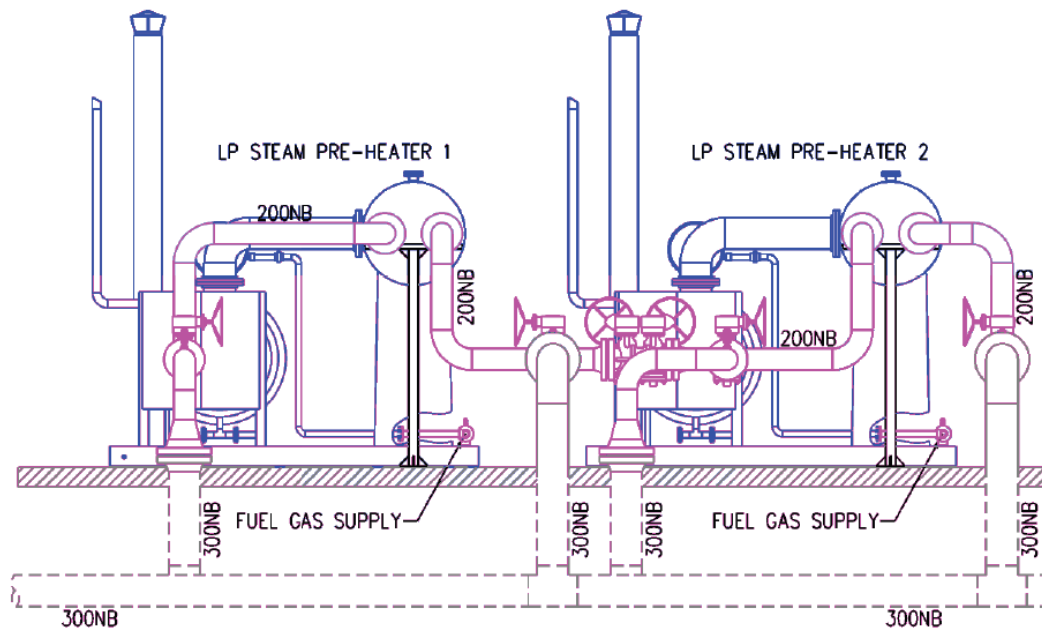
Elevation. Proposed Medium LP Steam units at Little Burdon.
